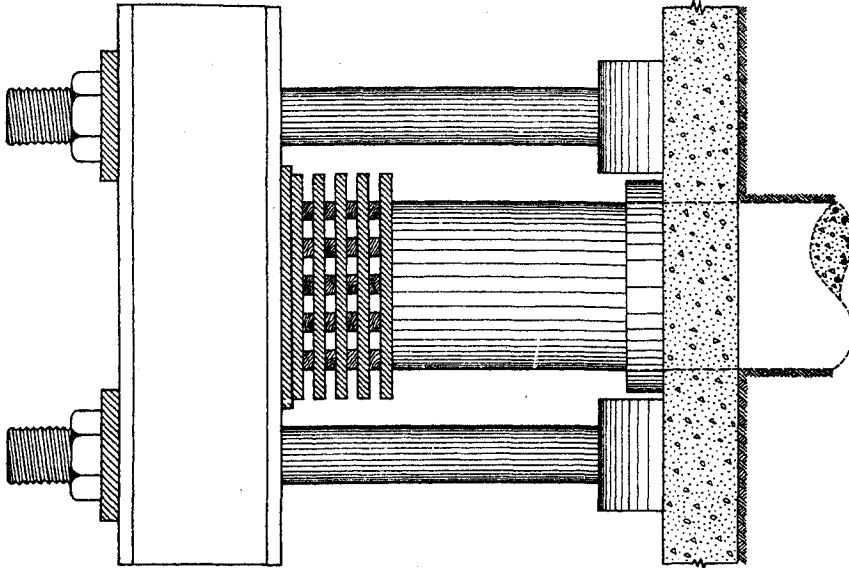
PILE WITH LOAD CONTROLLING MECHANISM
